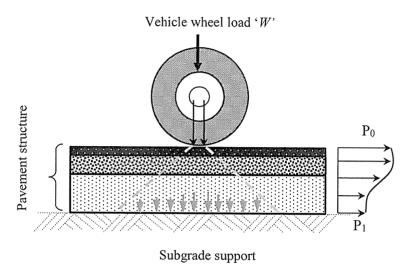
Wheel load 'W' is applied resulting in compressive stresses on the pavement structure (Adopted from Transit NZ, 2005).
